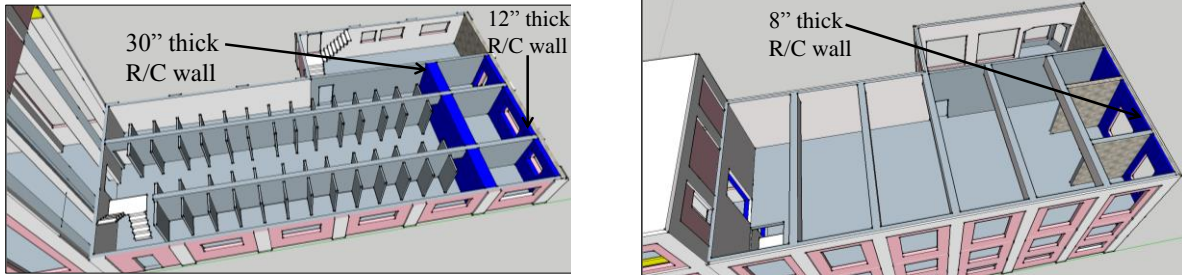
Structural Retrofitting Scheme for the Short Direction of Building 3
